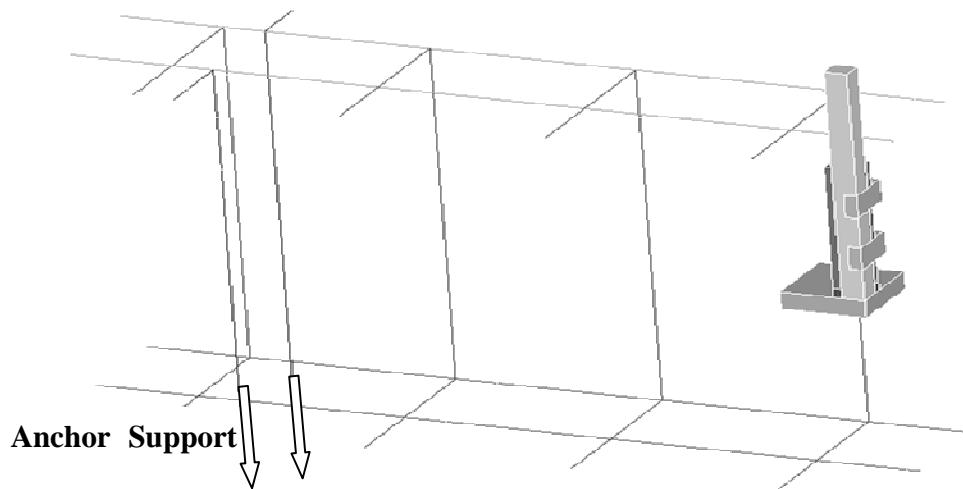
Support configuration modeled as tension anchors fully embedded in the concrete
